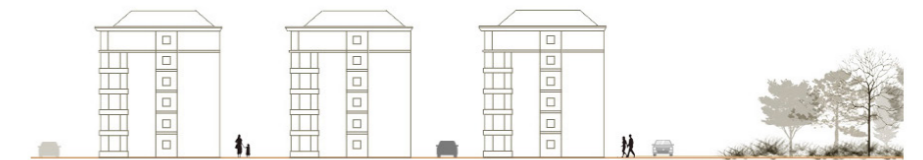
Section c-c' detail: experiment of adding bioswale 1
